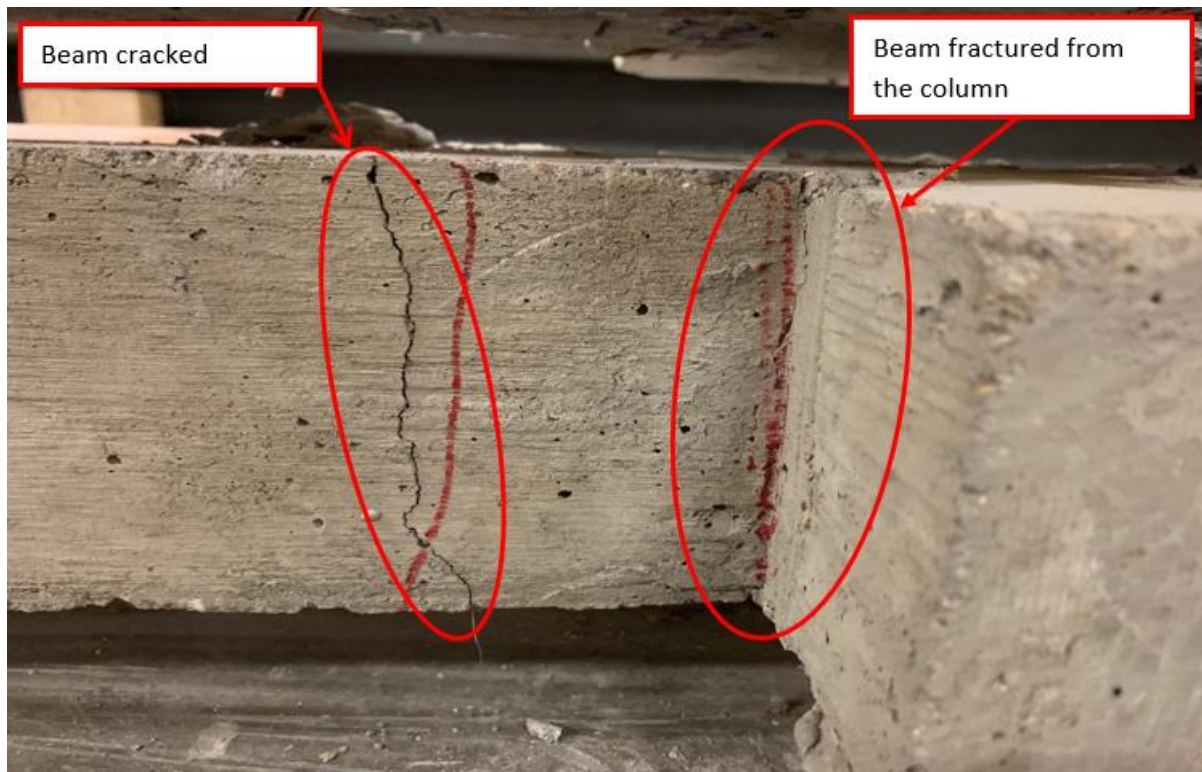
Underneath Crack Pattern in the Missing Column for Specimen B2-1
